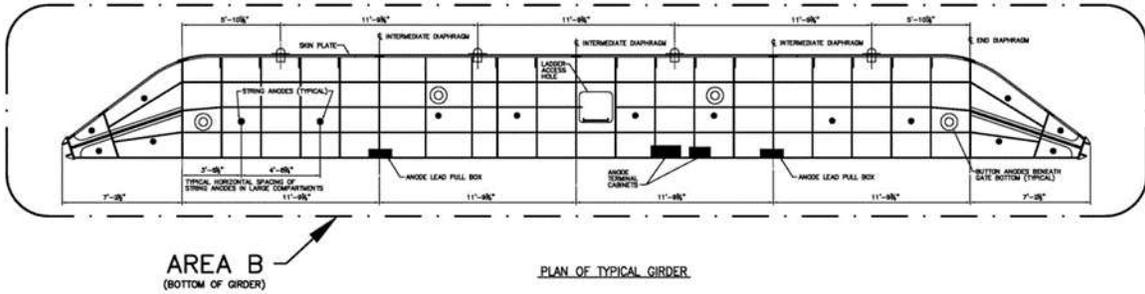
Plan View of Girder for Selden Lower Lock Gate
